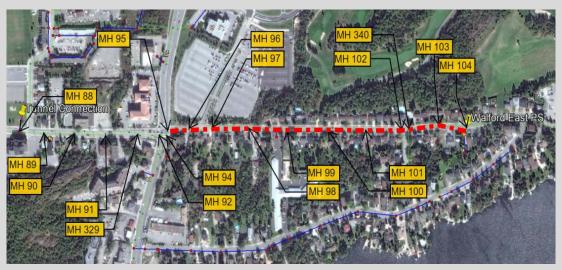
Manhole locations surrounding Walford East Pumping Station
